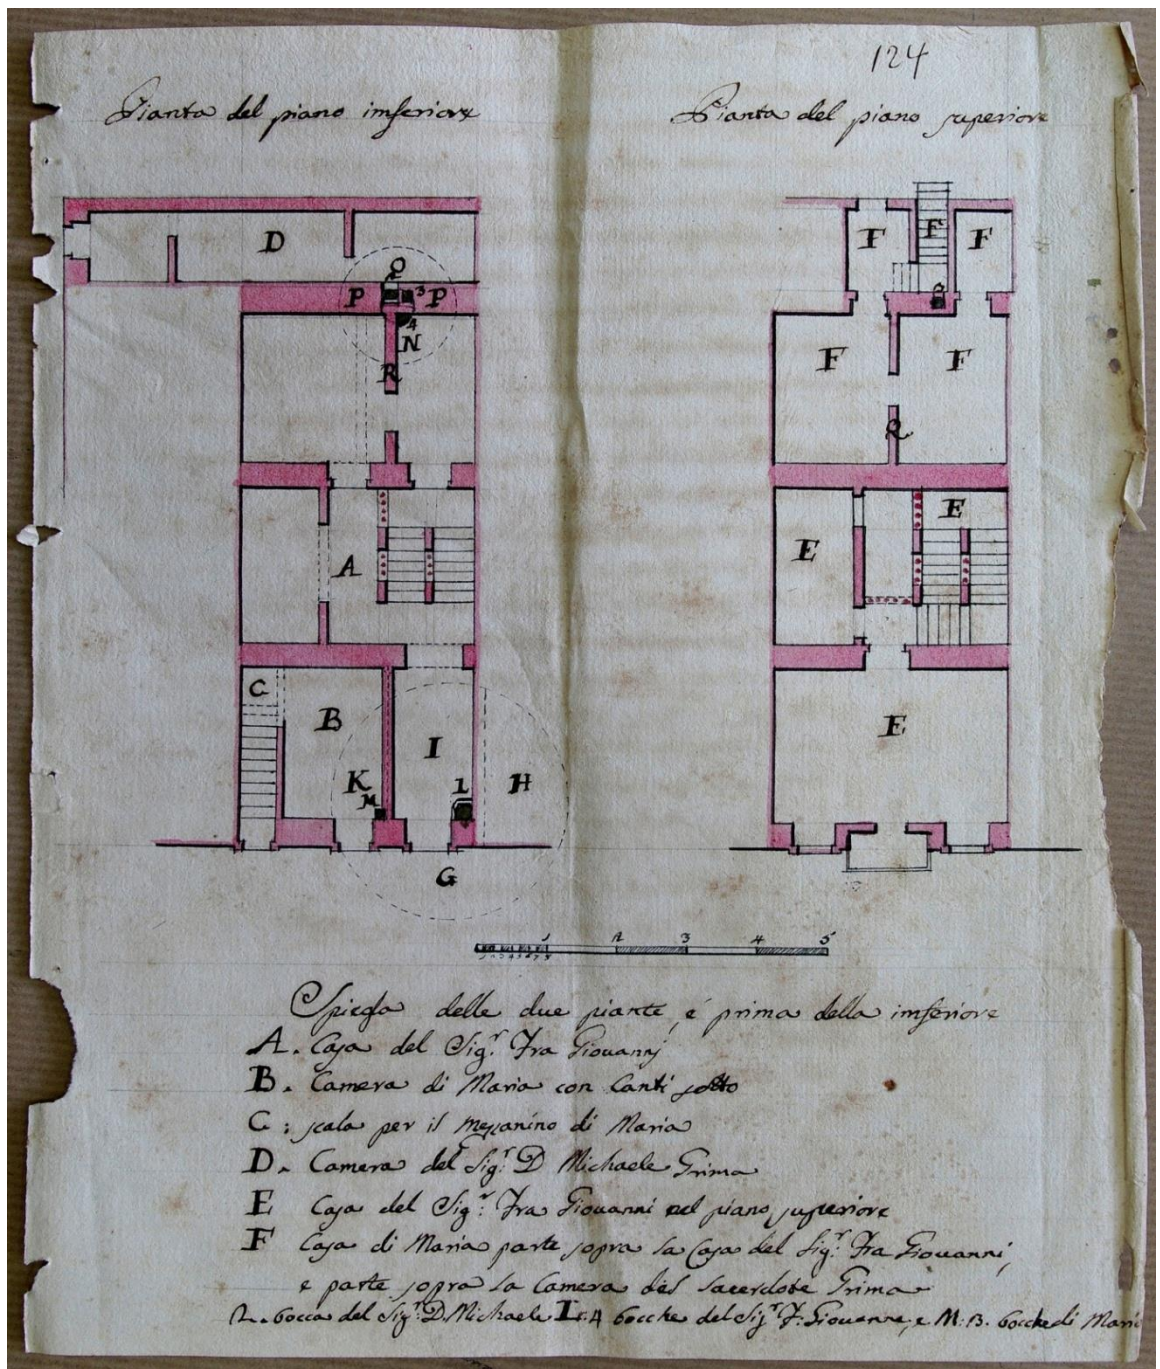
Plan of a small house divided between four people.²²⁶
